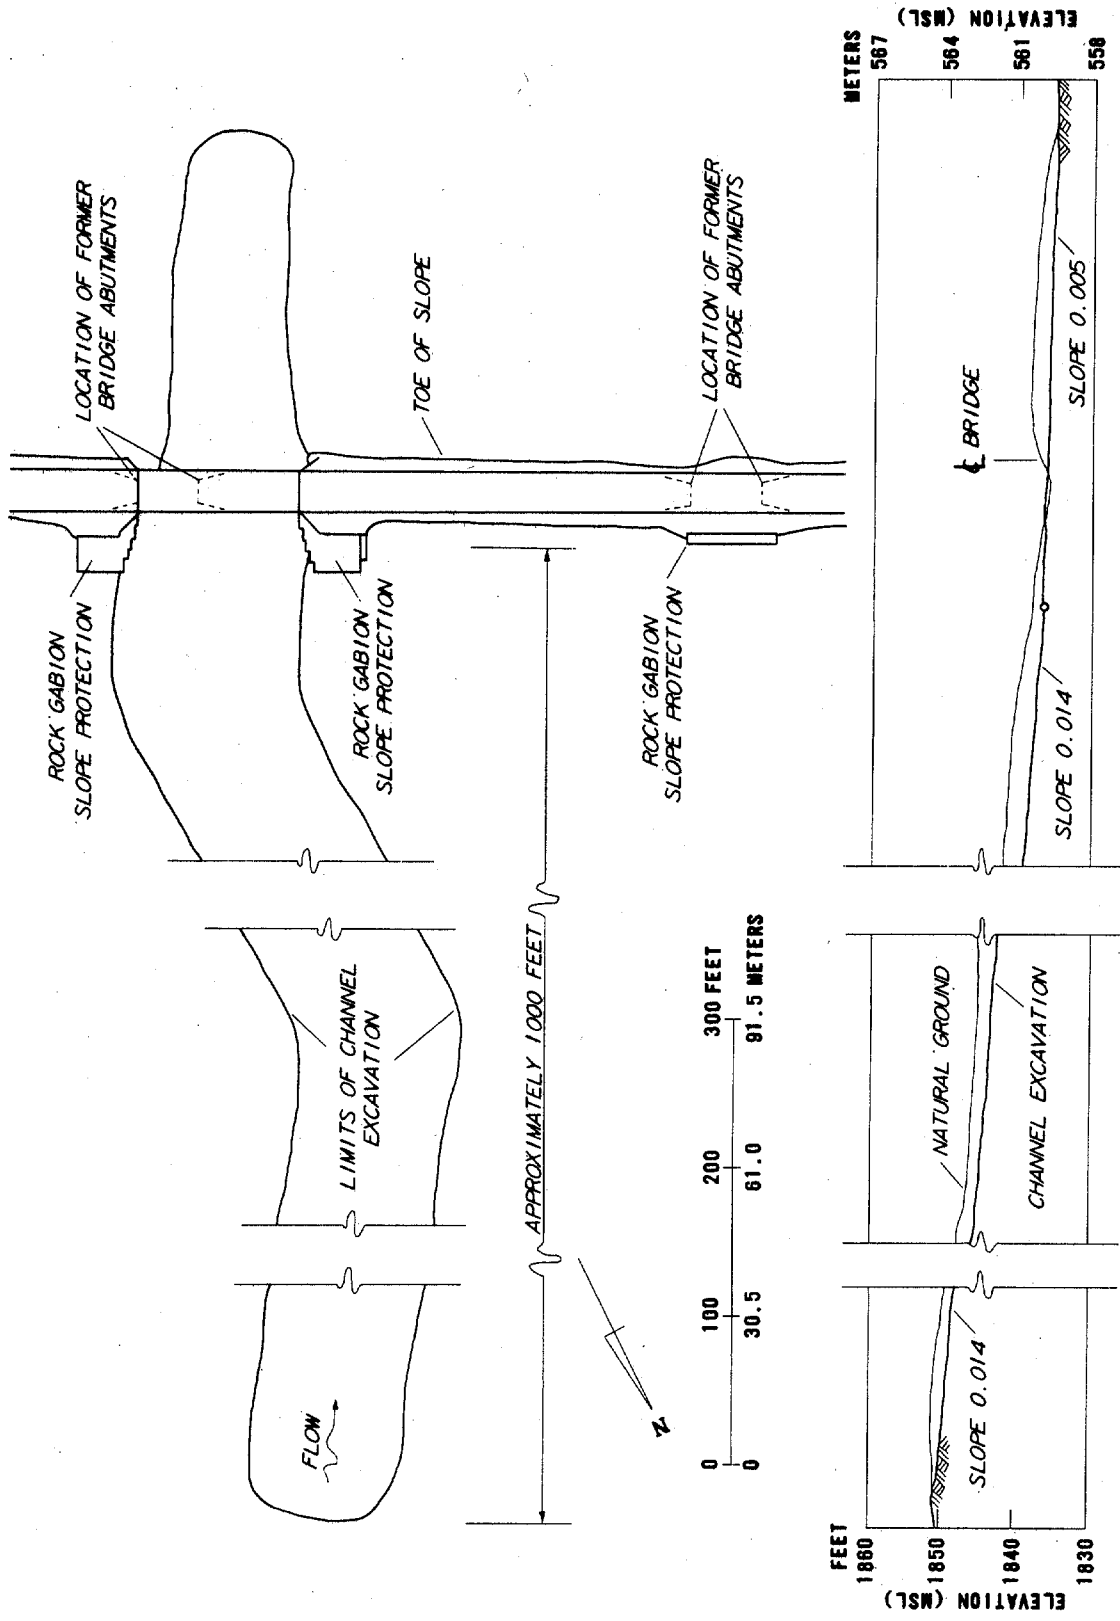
Plan and profile of Smokehouse Creek at Forest Service road 20N01.6.
